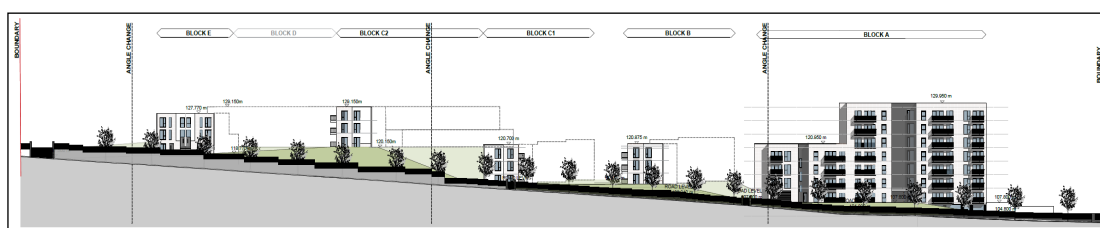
Option C Contextual Elevation to Stocking Ave.
